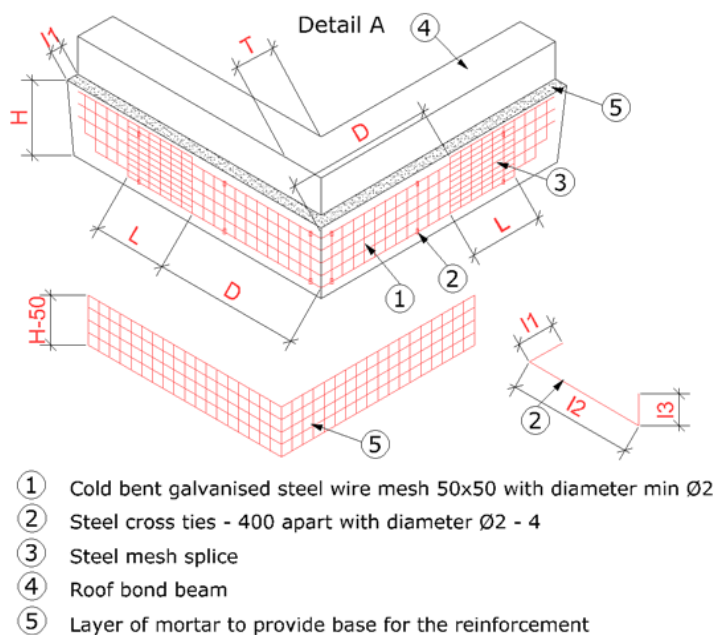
Tying of walls with steel mesh- detail
